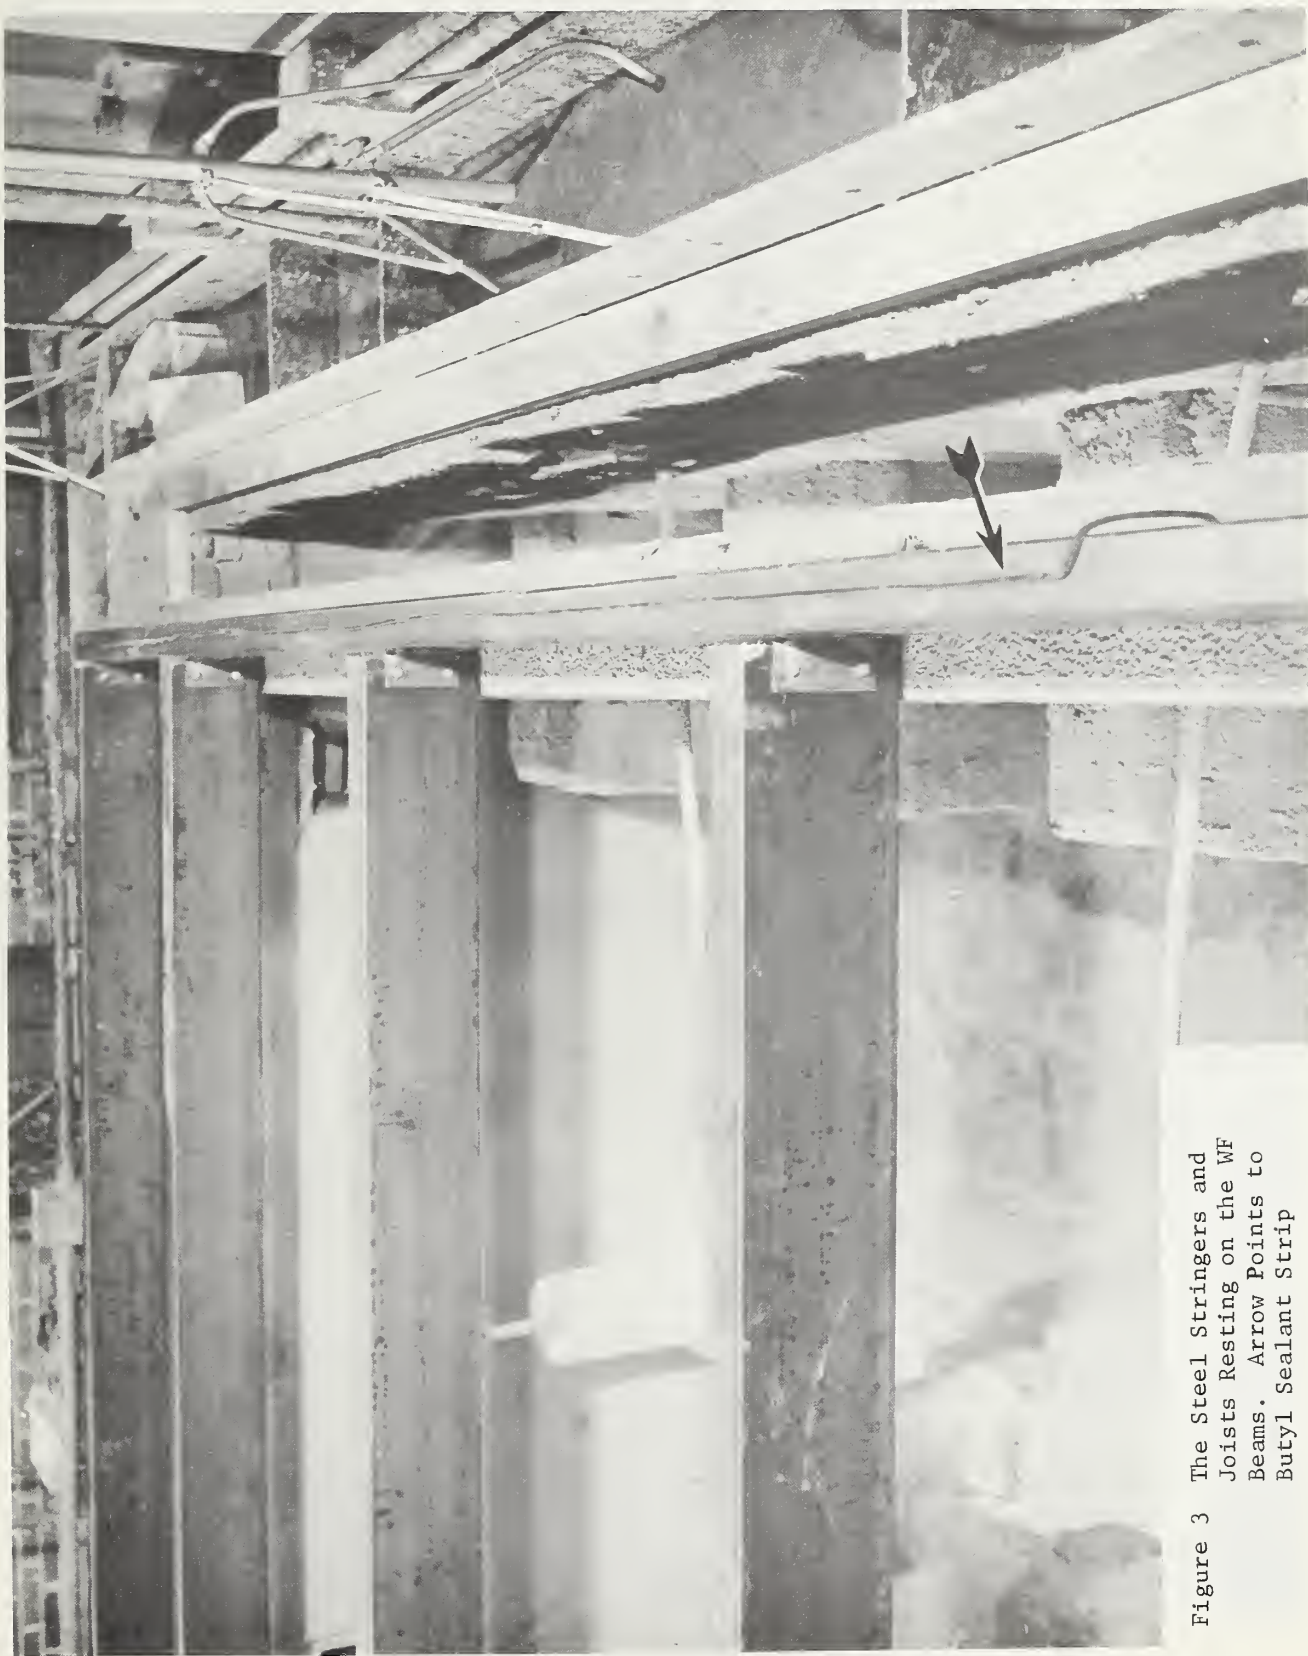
The Steel Stringers and Joists Resting on the WF Beams. Arrow Points to Butyl Sealant Strip
